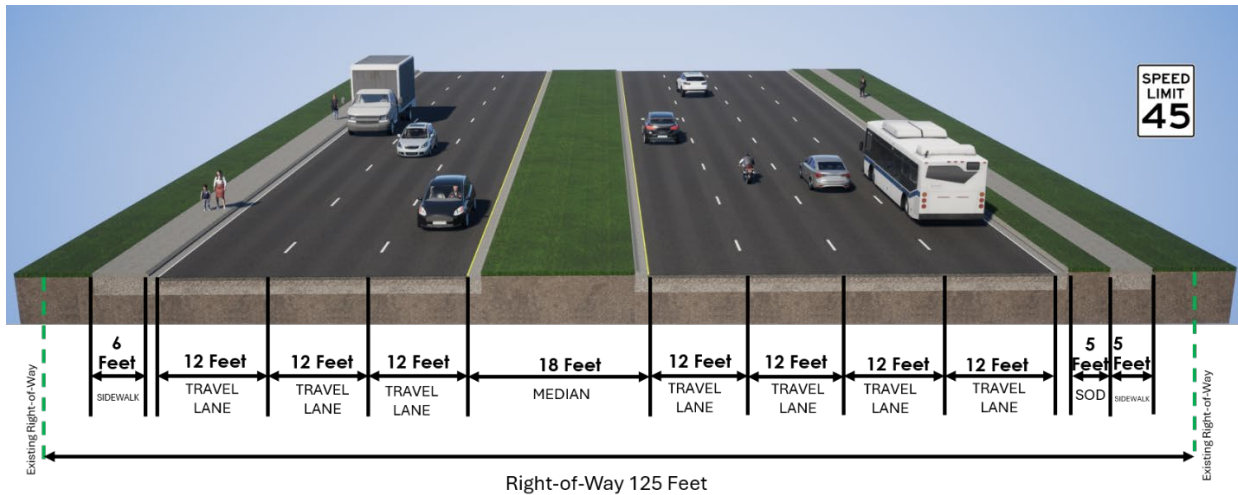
Existing Roadway – South of 13th Avenue to 9th Avenue
